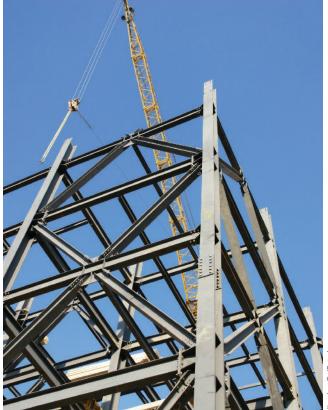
The architectural team determines the shape and style of the structure. The structural engineering team is responsible for determining the size of materials to resist the loads and stresses that a building will face.
